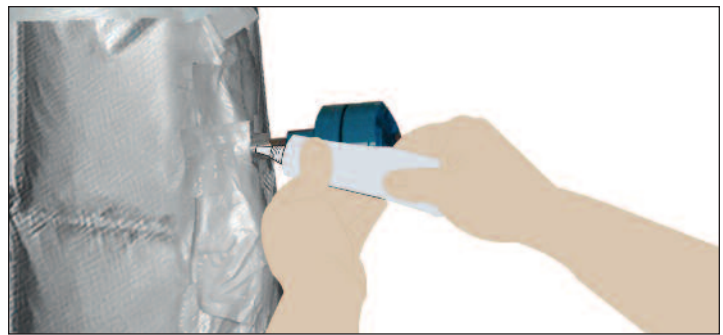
Apply silicone caulk to seal penetrations to limit water vapor intrusion to the cold metal pipe and valve surfaces where it will condense into liquid water
